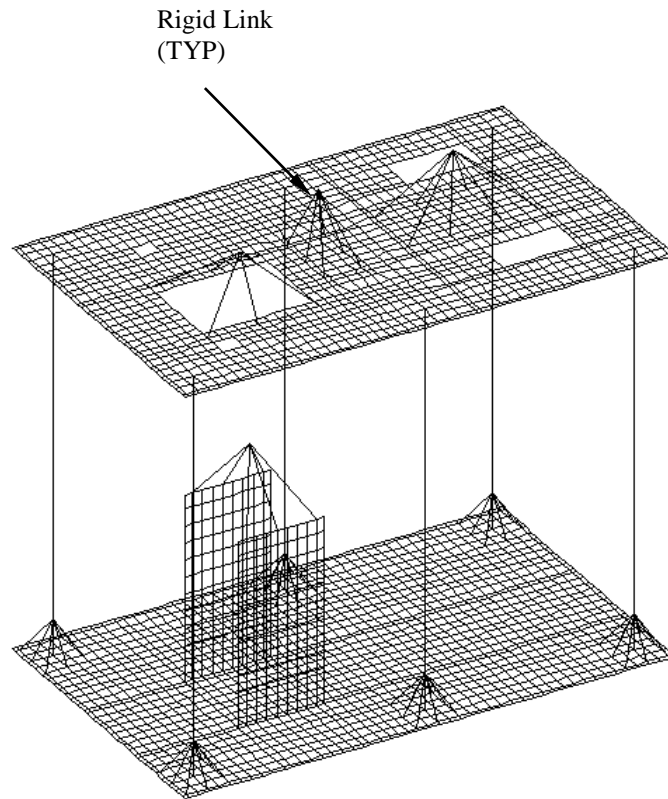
Beam and Shell Element Model of Frame Foundation with Base Raft
